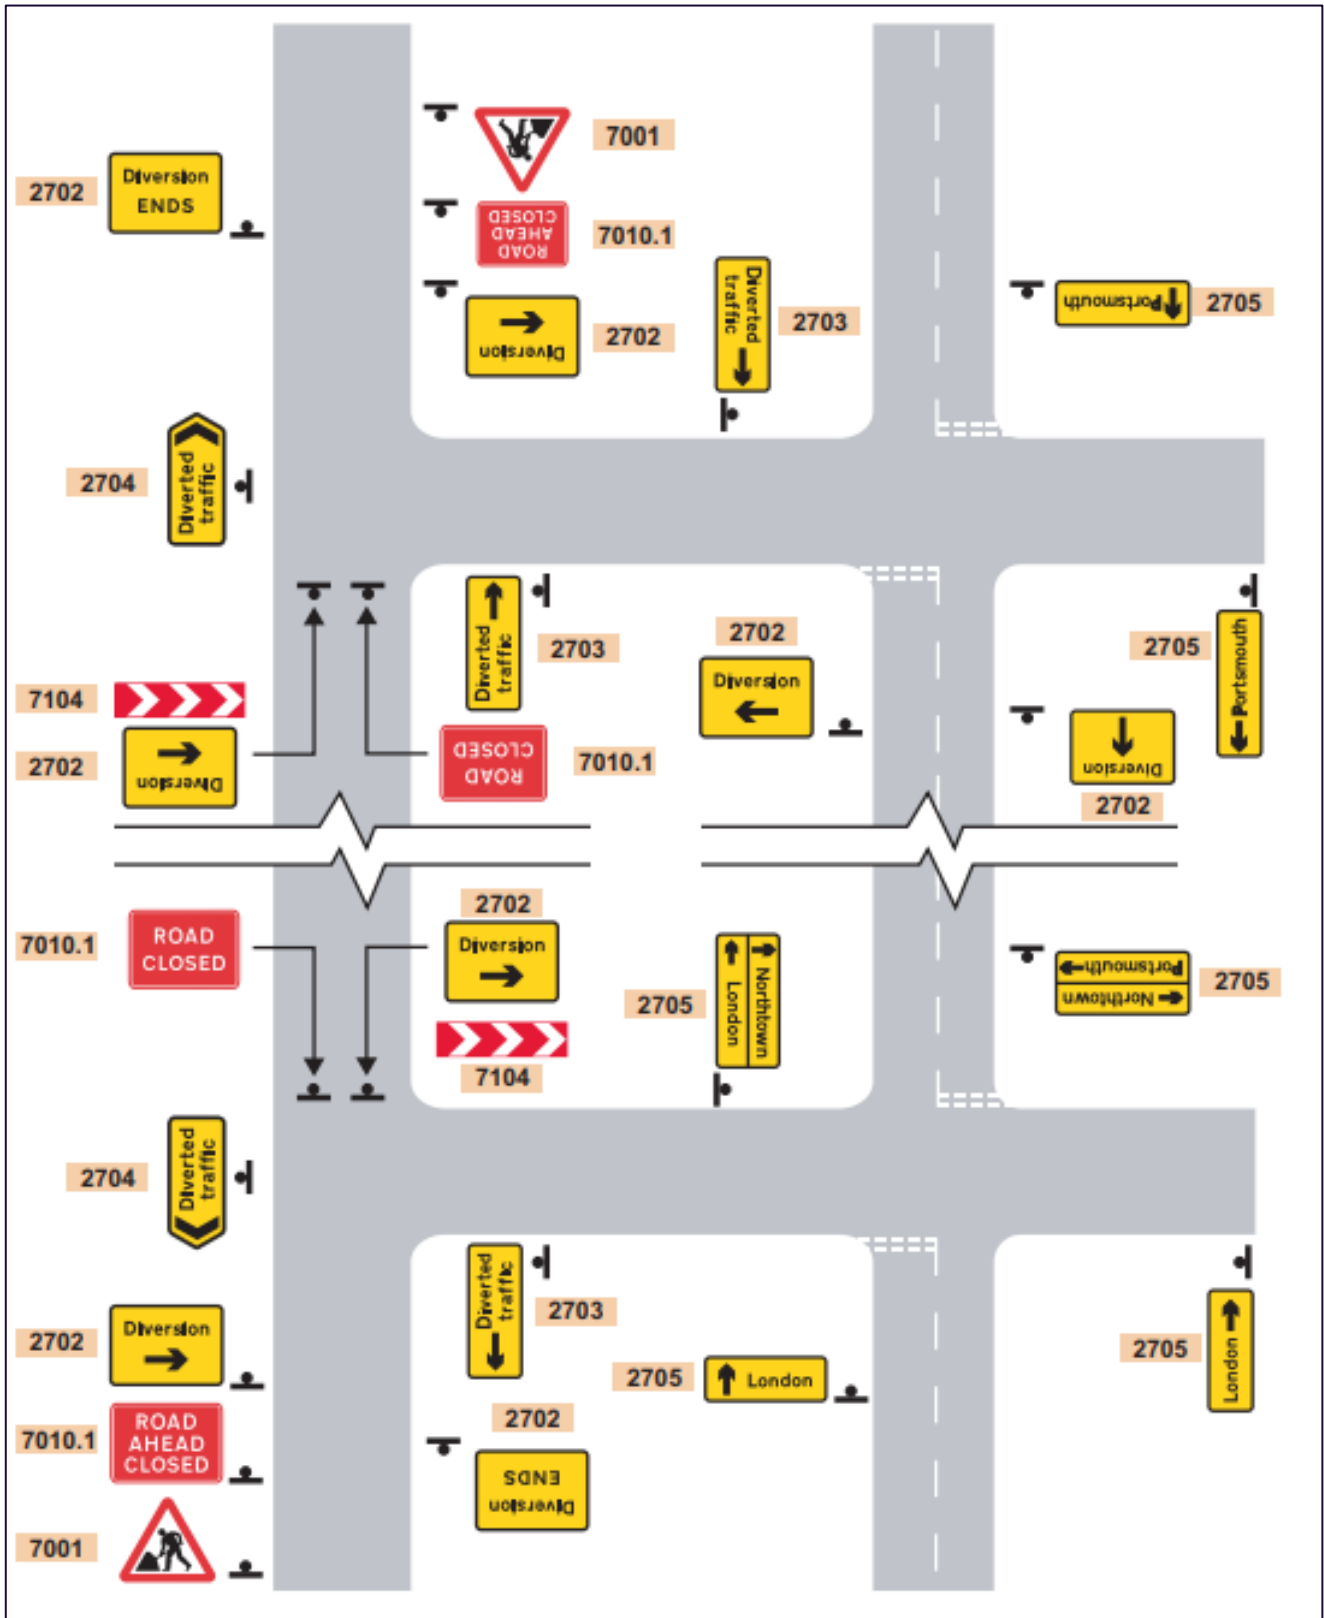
Layout of signs for road works on single carriageway roads with diversions.
